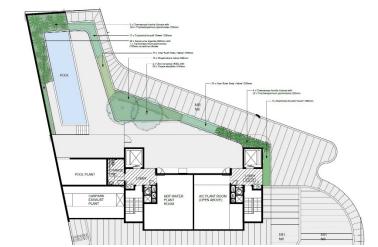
Landscape Plan Roof Terrace (Courtesy of Danger Barin Smith)
